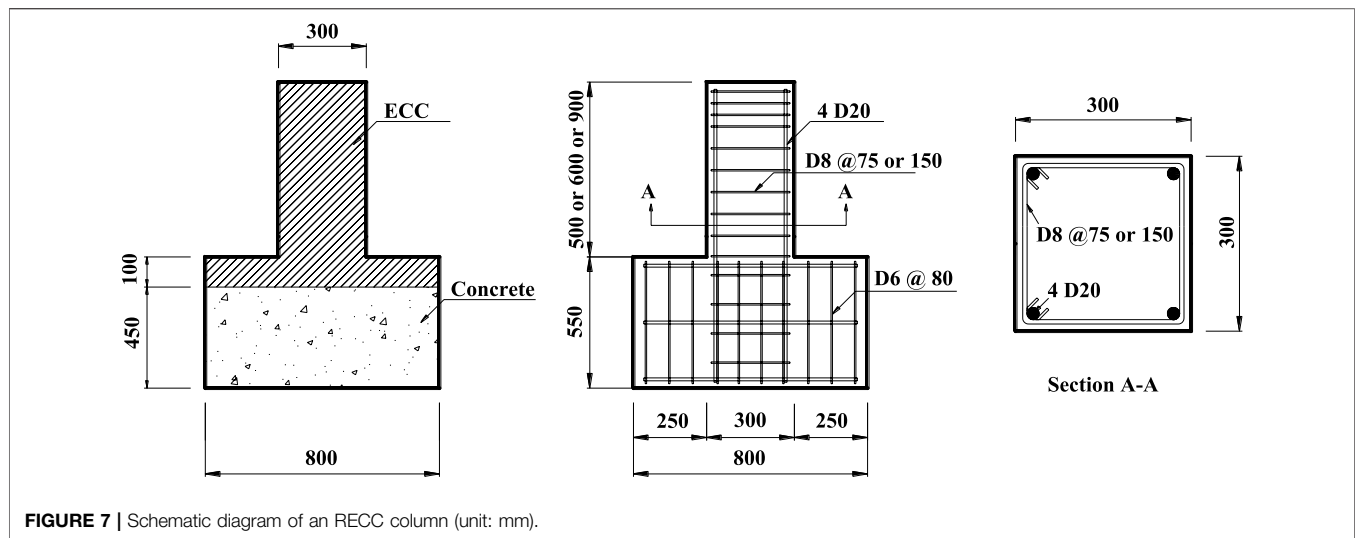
| Schematic diagram of an RECC column (unit: mm).
